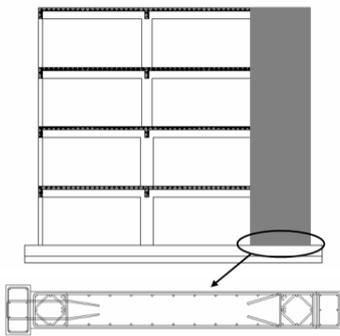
Elevation view of the retrofitted R/C frame and cross-section detailing of the infill wall
